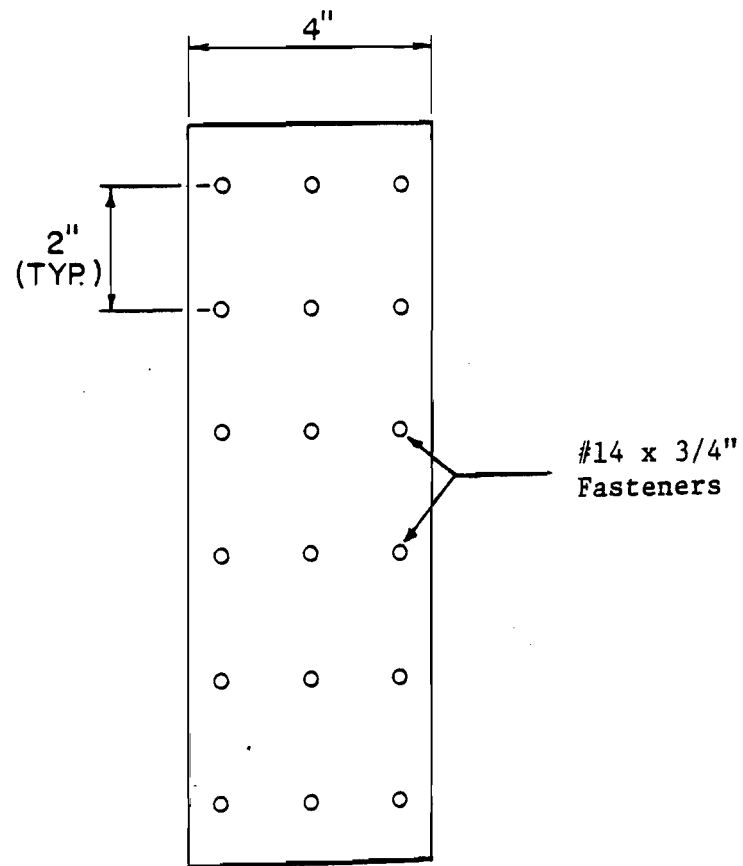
Fastener Arrangement in the Web of CS (Stub Column) Specimens
